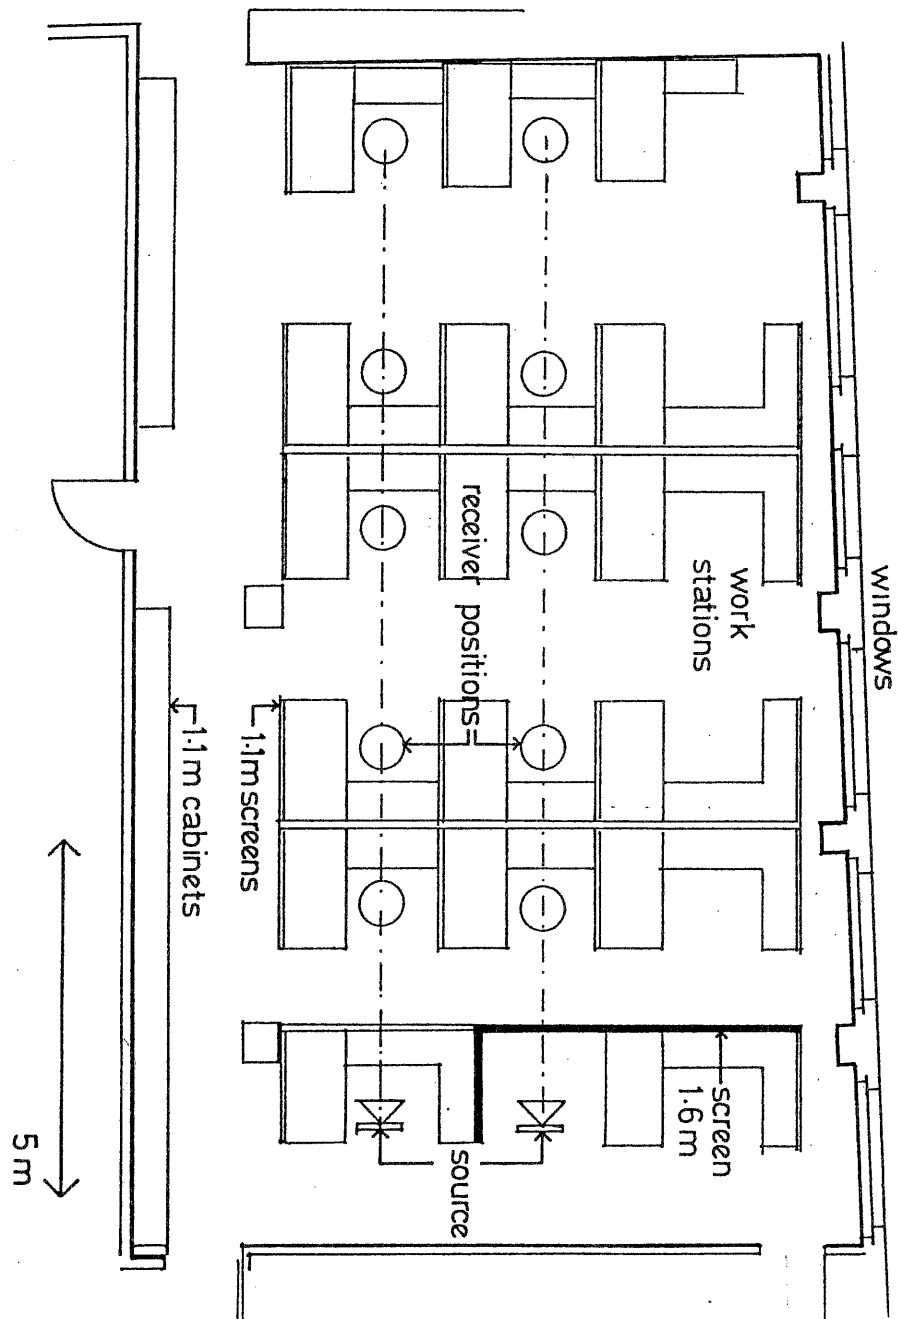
PLAN OF OPEN PLAN OFFICE
